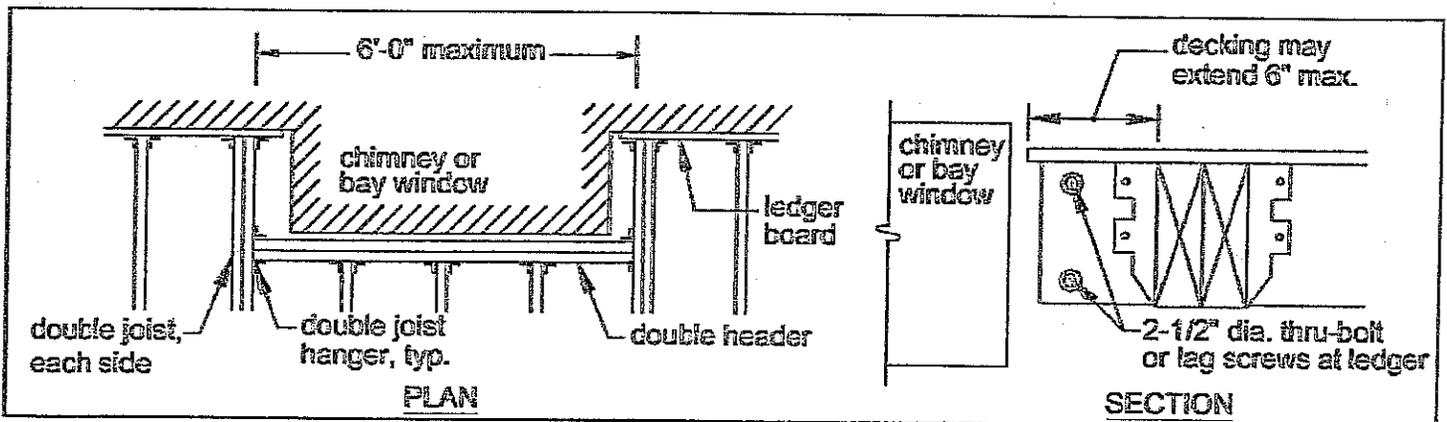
REQUIREMENTS FOR FRAMING AT CHIMNEY OR BAY WINDOW
